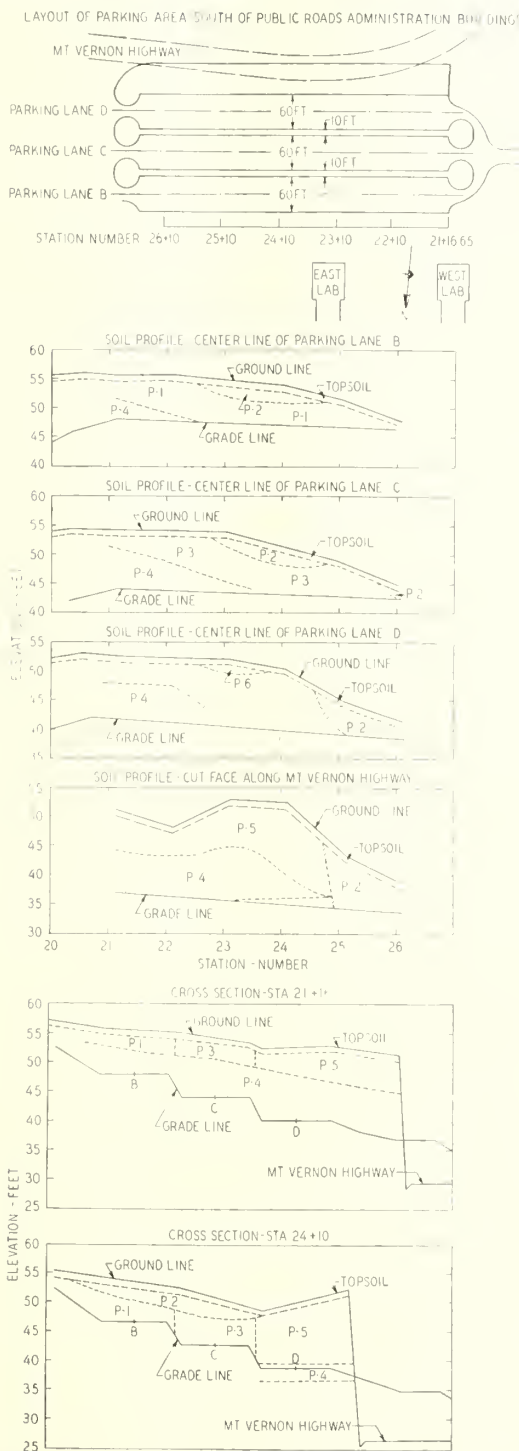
LAYOUT, SOIL PROFILES, AND CROSS SECTIONS OF BINDER SOIL PIT AT PARKING AREA.
